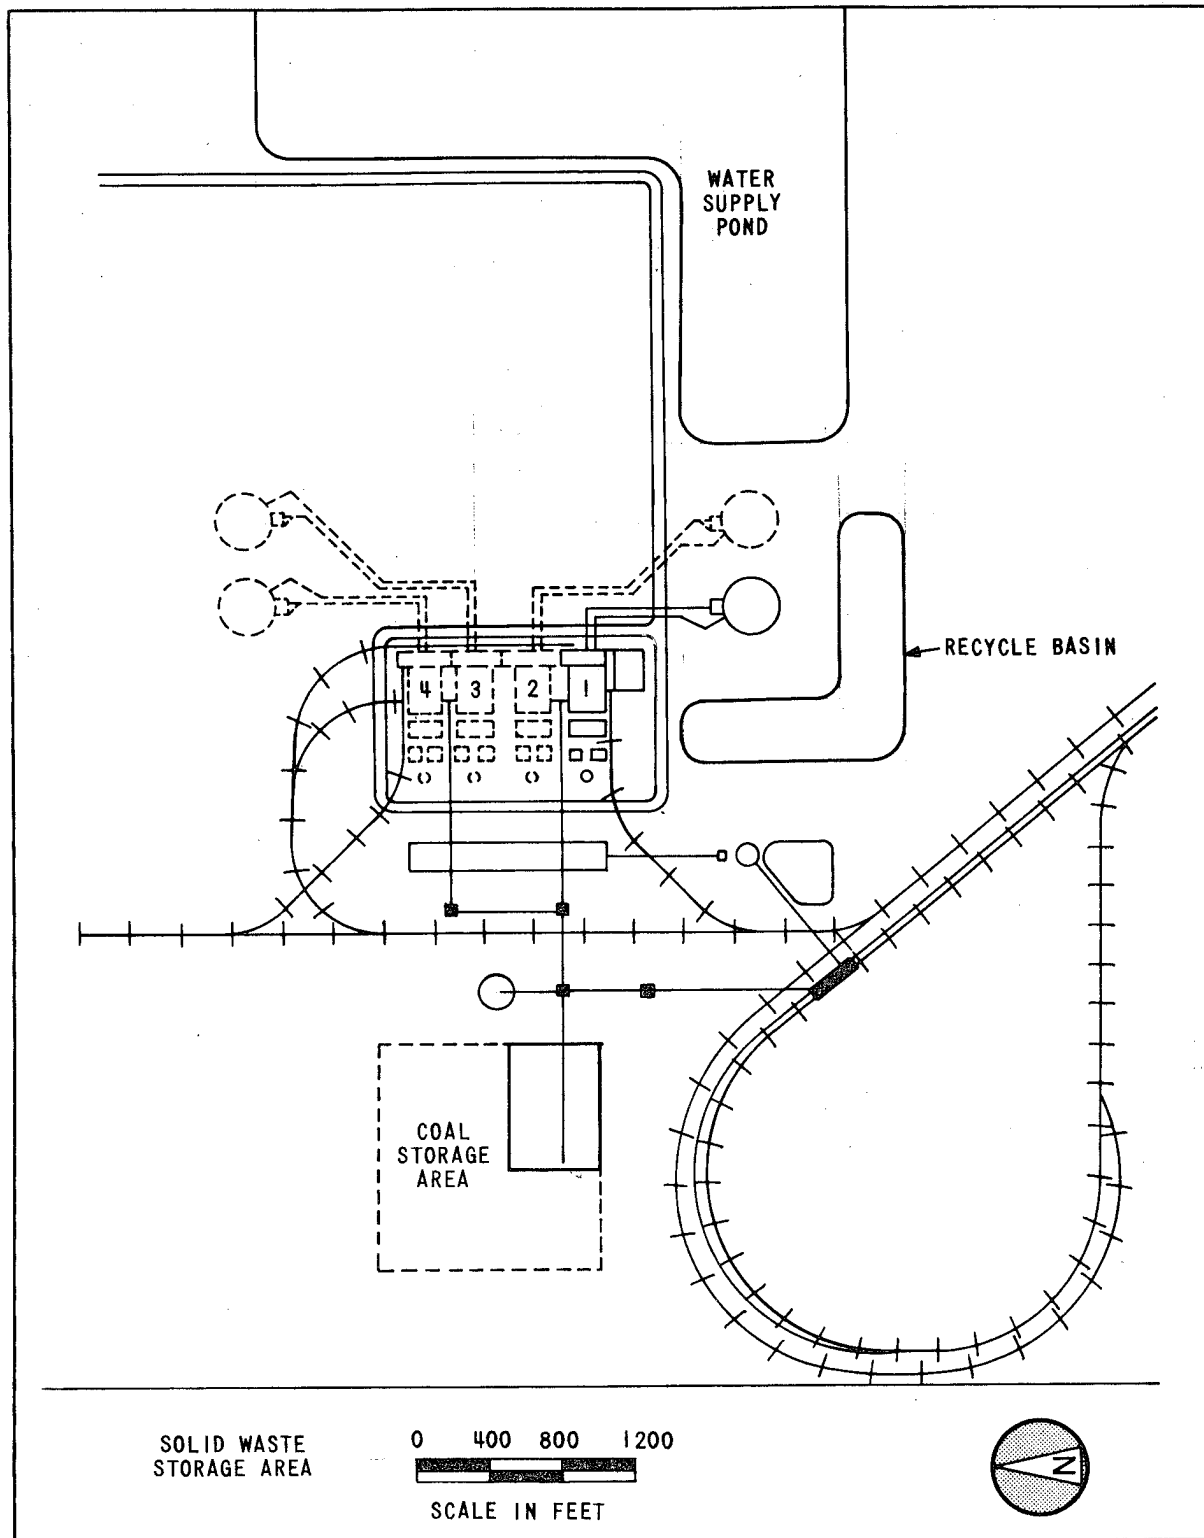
NATURAL DRAFT COOLING TOWER SITE ARRANGEMENT
